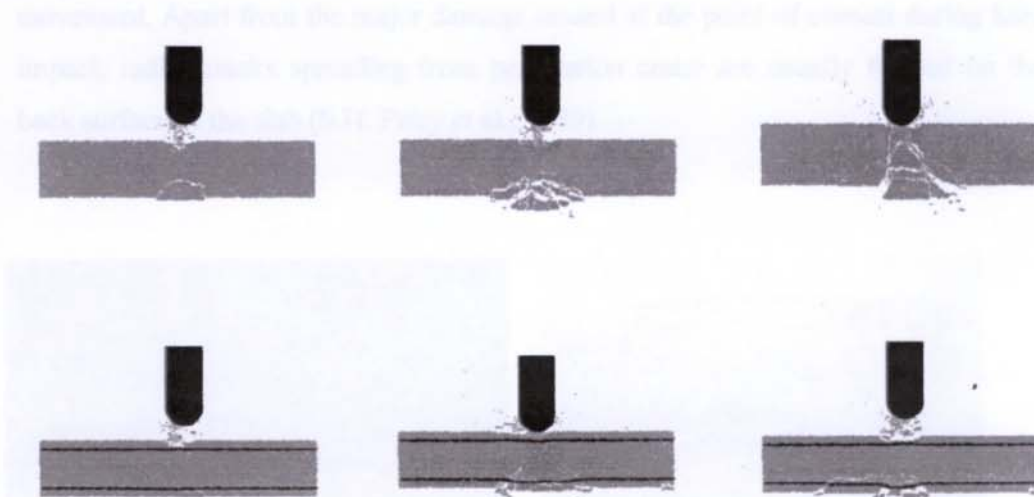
Impact phenomena for concrete and reinforced concrete structures, spallation on impact face, scabbing on back face and perforation.
